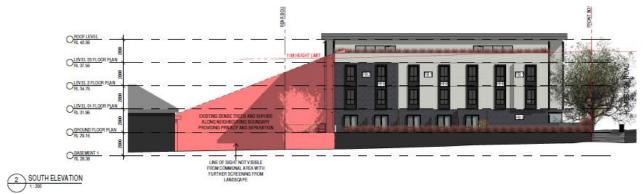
Original Southern elevation showing a part four (4) storey presentation and contravention of the 11m building height control.
